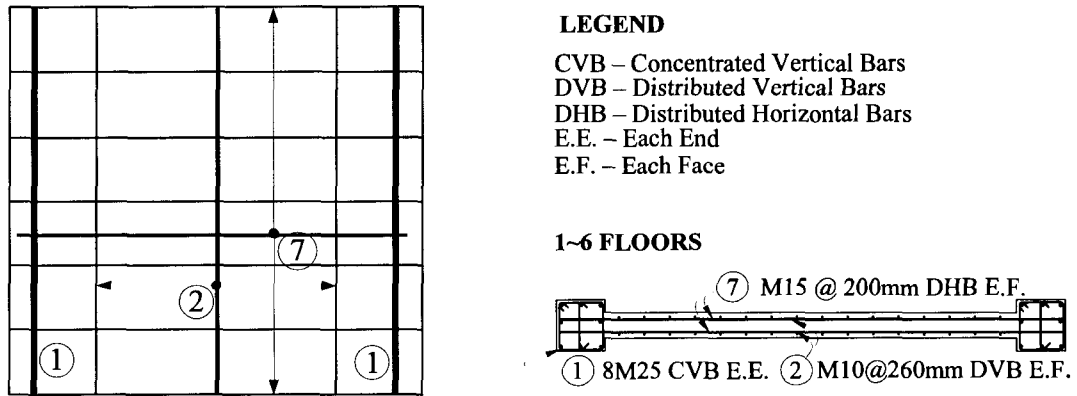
Shear wall reinforcement in B6 building located in Vancouver.
